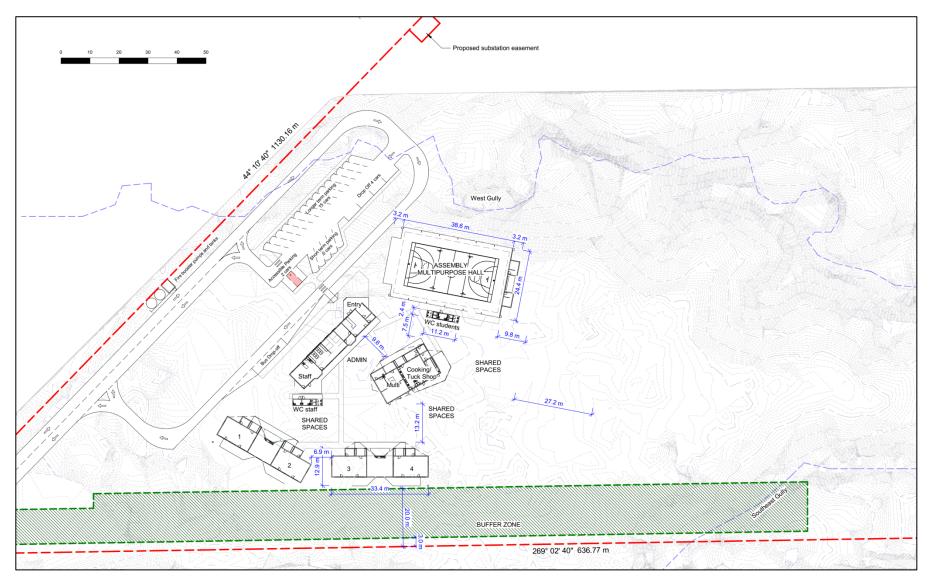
PROPOSED STAGE 3 PLAN
